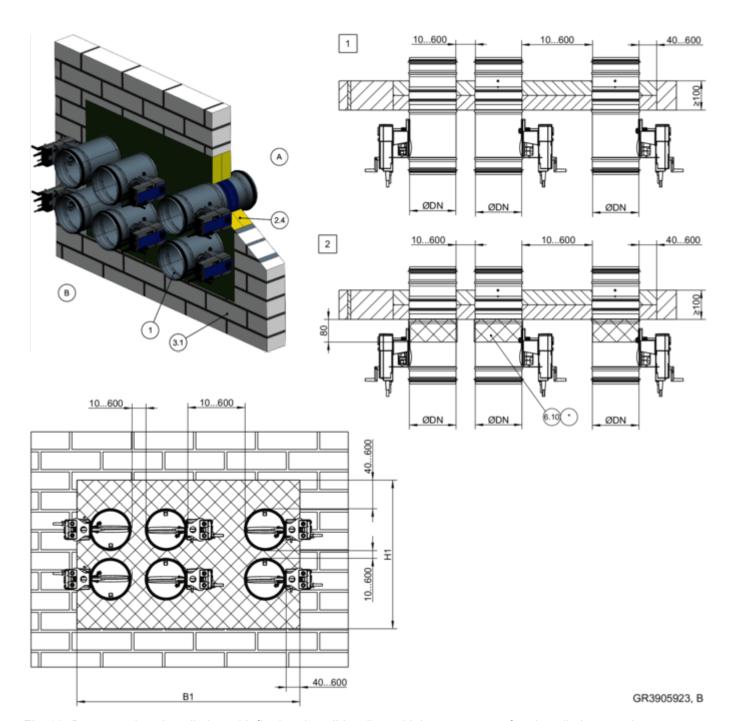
Dry mortarless installation with fire batt in solid wall - multiple occupancy of an installation opening
